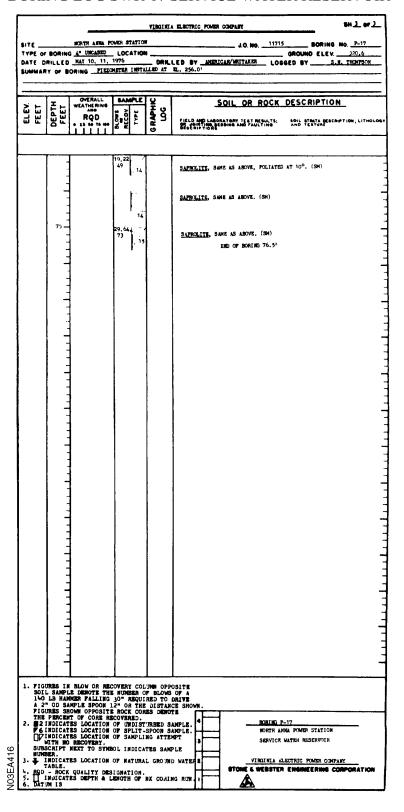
SERVICE WATER RESERVOIR PLAN BORINGS S.E. DIKE SECTION
